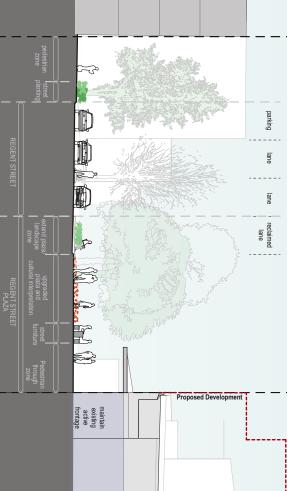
Street Typology Section C - Regent Street Traffic Condition
